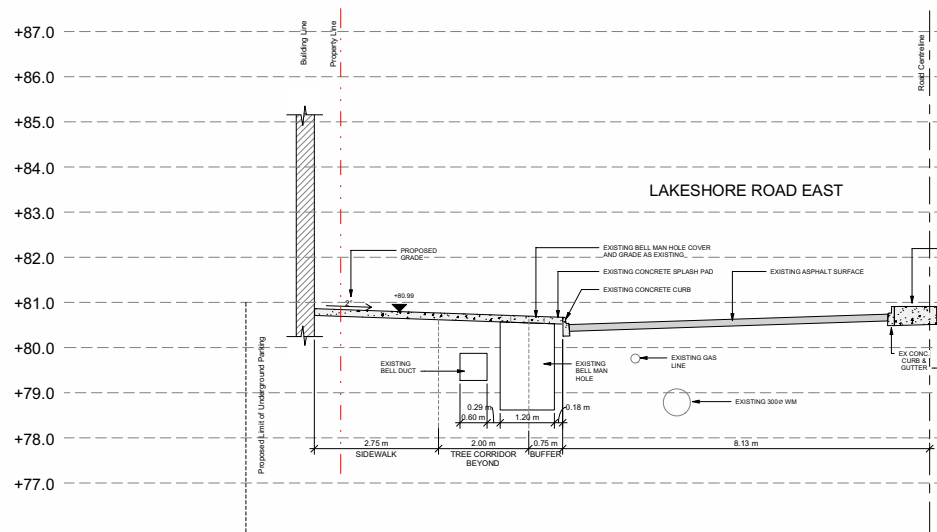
Section A-A existing Bell manhole location and grade maintained (please see Appendix 1 for 1:50 sections)
